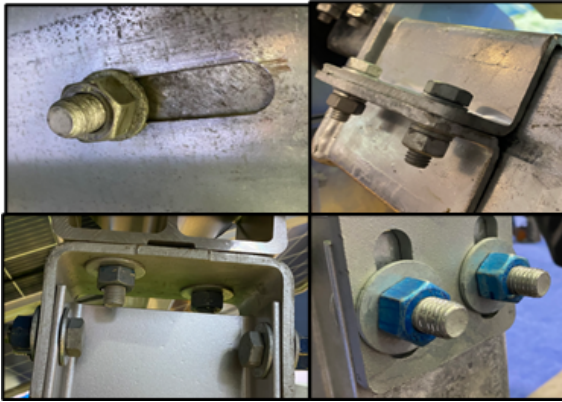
Saddle-bracket to pile, and inter-rack joints (1/2 inch and larger bolts) are categorized as traditional structural joints under the MOP.
